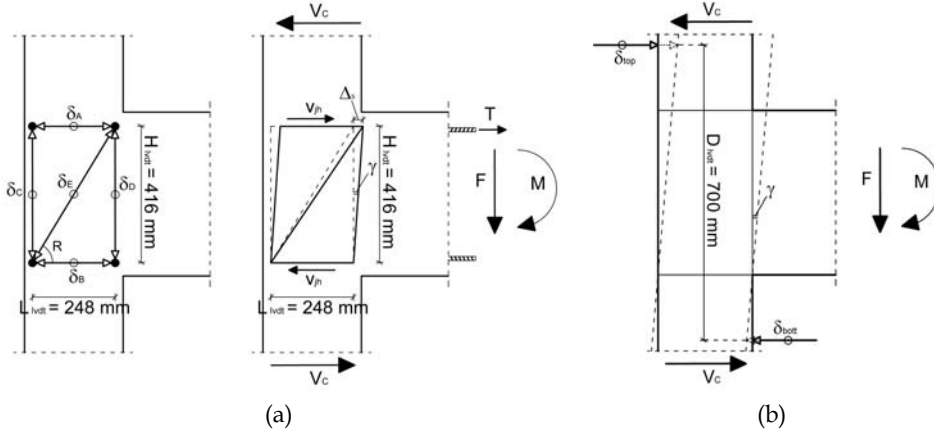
LVDT layout to monitor: a) joint shear deformations; b) joint drift.
